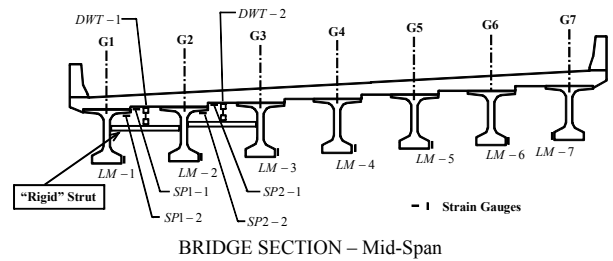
B-20-148 cross-sections with instrumentation locations and layout
